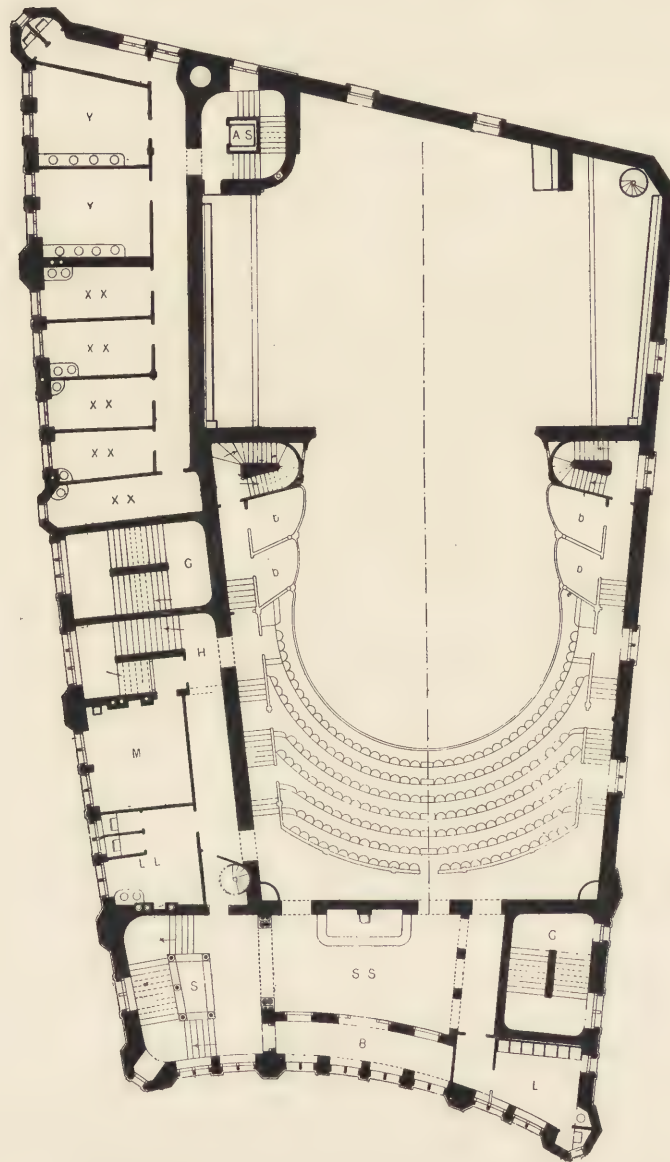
PLAN OF SECOND FLOOR (SECOND CIRCLE).
